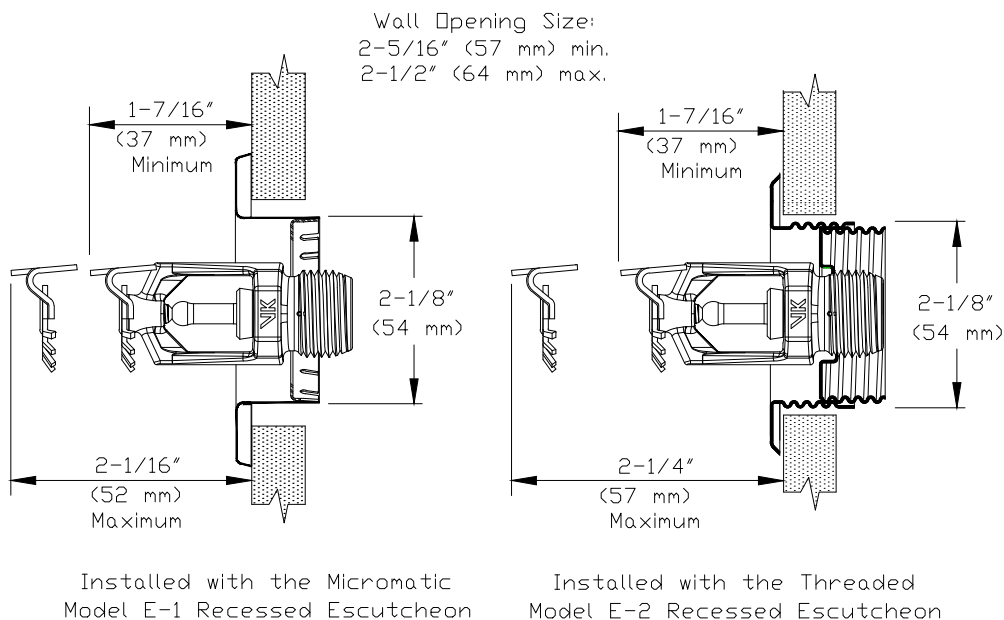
Horizontal Sidewall Sprinkler Dimensions with the Model E-1 and E-2 Recessed Escutcheons
